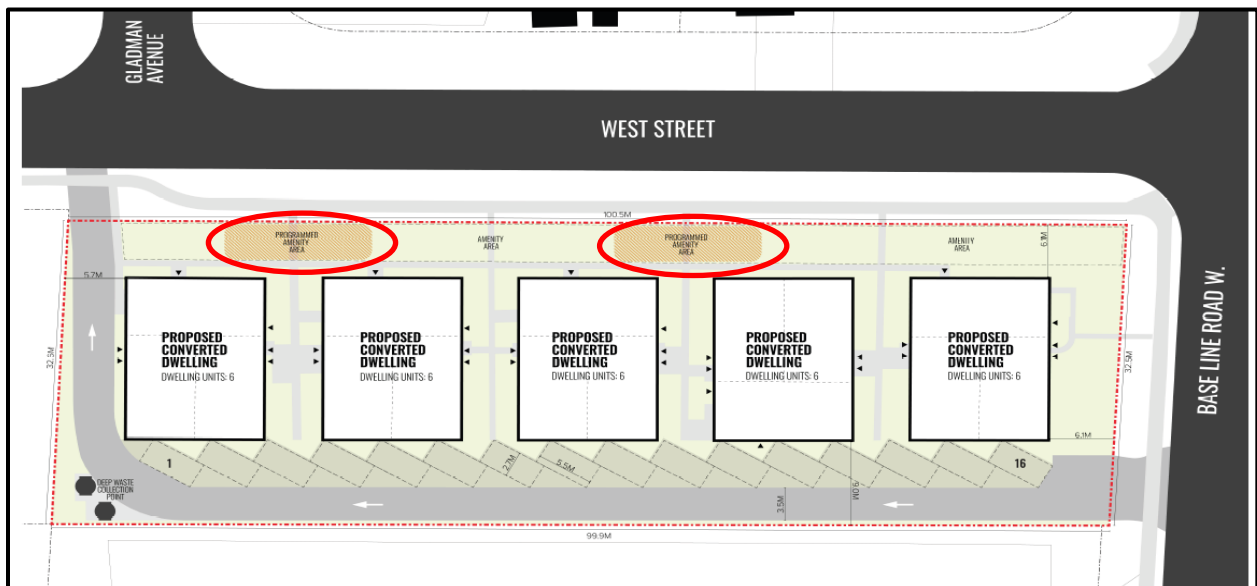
Conceptual Site Plan, showing the residential amenity space.
